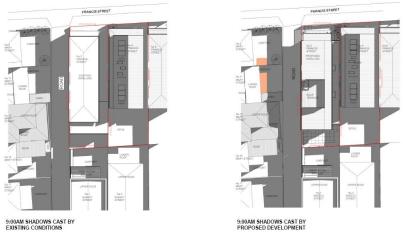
Existing and proposed shadow diagrams at 9pm at the September Equinox
